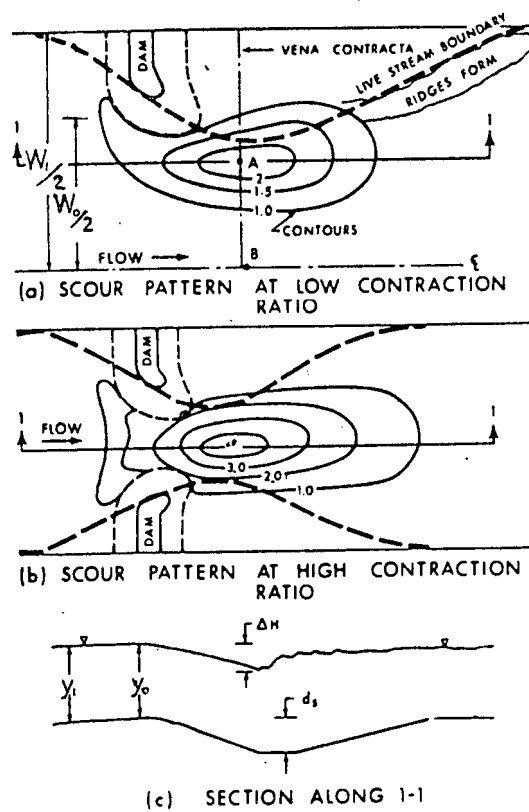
Typical Scour Patterns at End-dump Constriction
